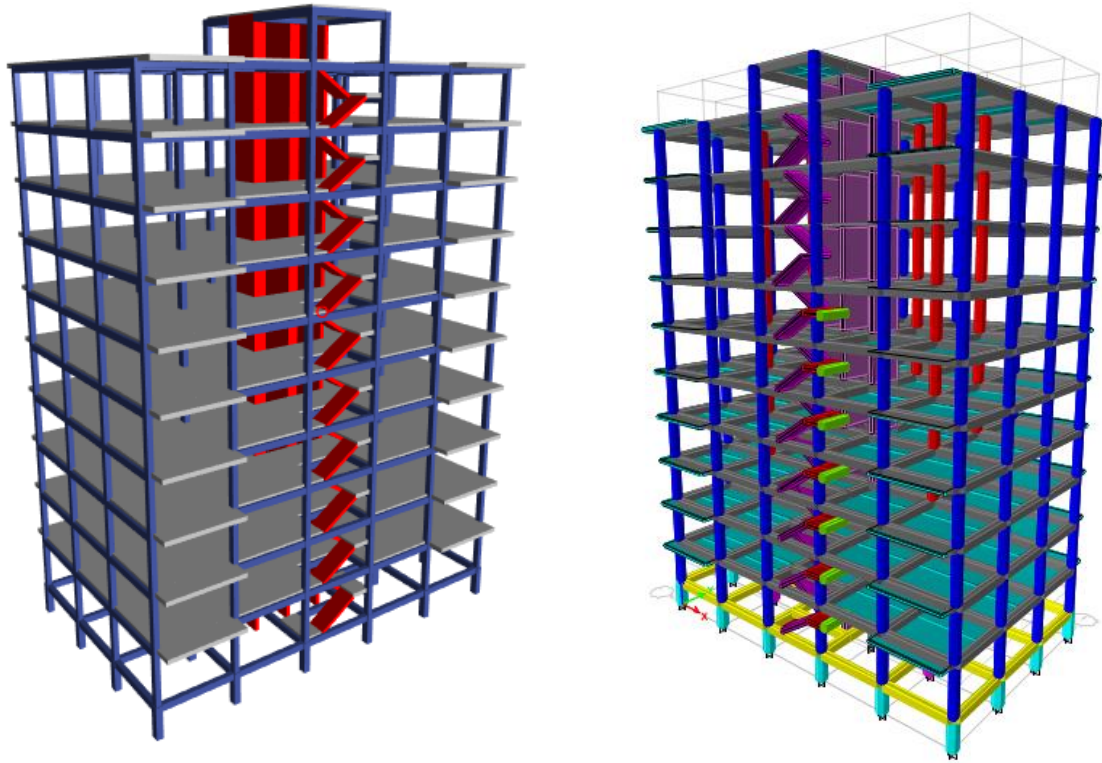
3D Model of 10 storied Residential building with shear wall
